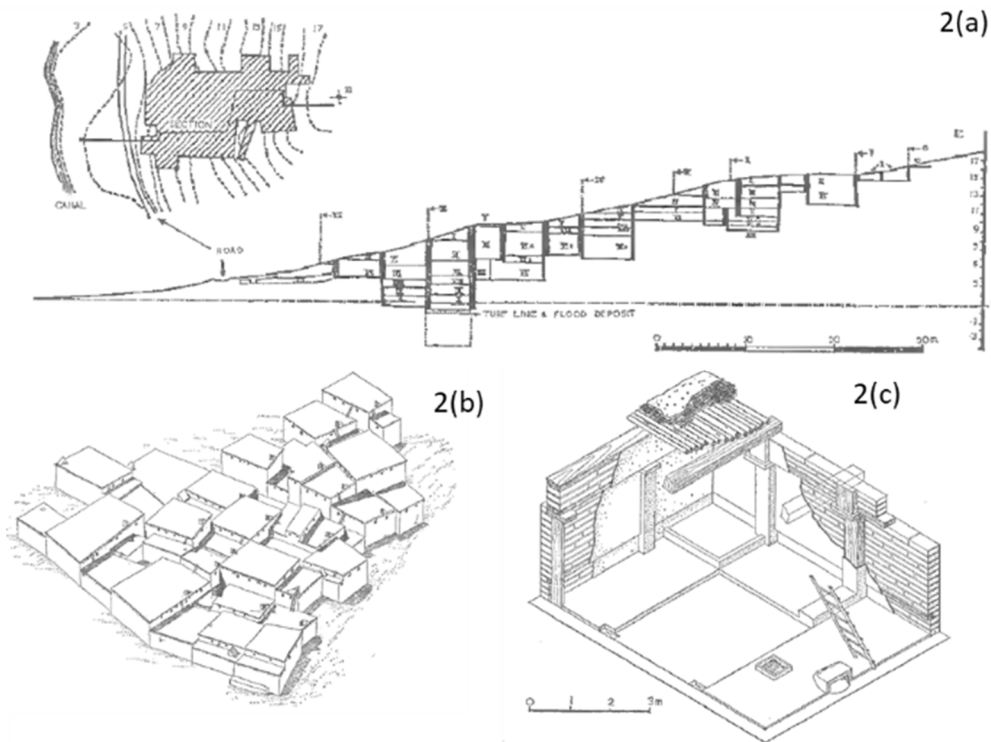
(a): Plan and Section of Catal Hüyük showing the shifting pattern of excavated area
